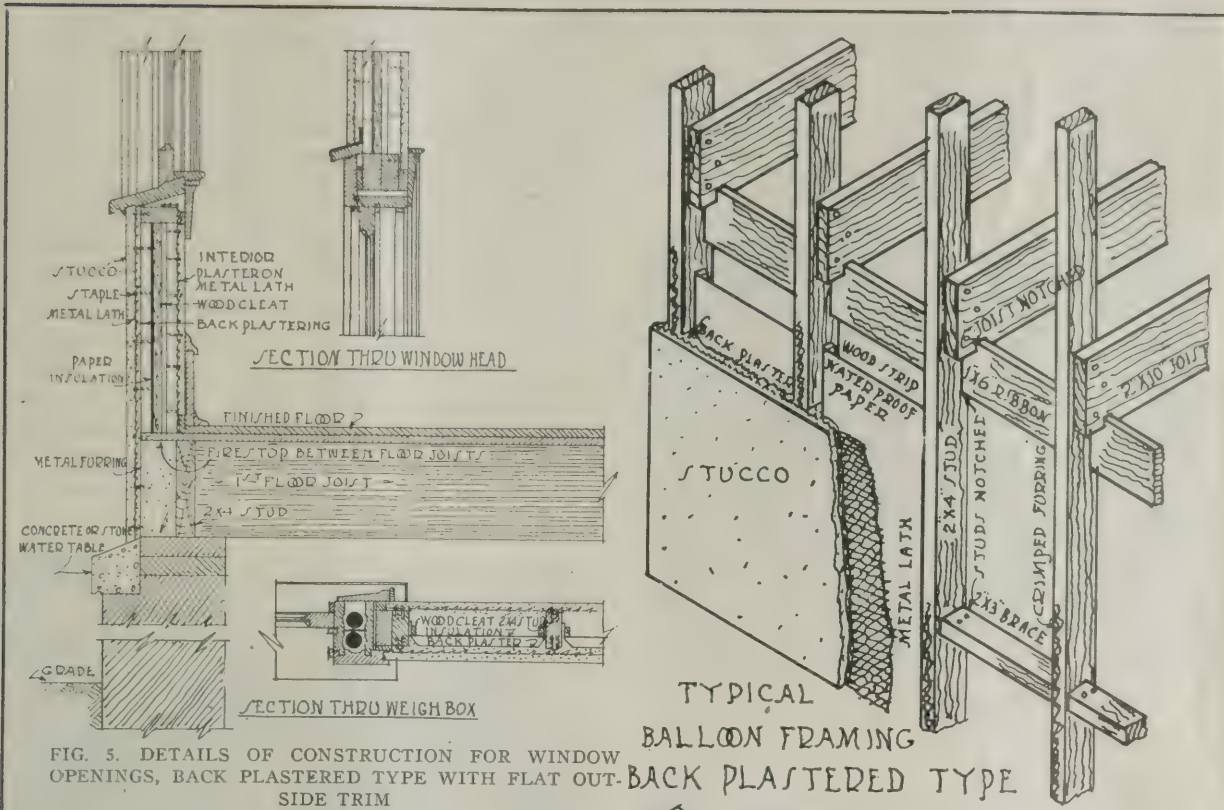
DETAILS OF CONSTRUCTION FOR WINDOW OPENINGS, BACK PLASTERED TYPE WITH FLAT OUTSIDE TRIM
